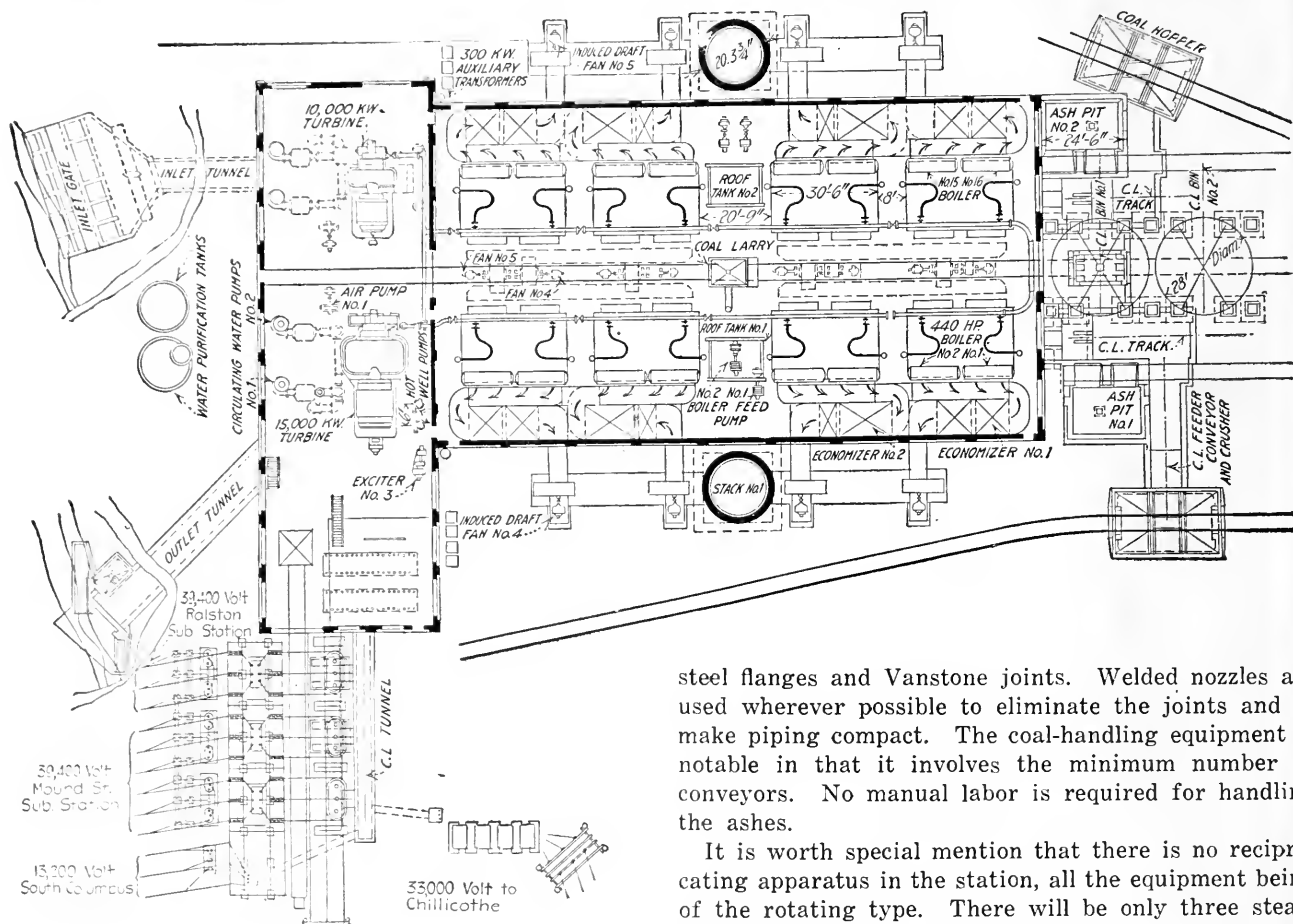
LAYOUT OF STATION EQUIPMENT AND OUTDOOR ELECTRICAL APPARATUS
